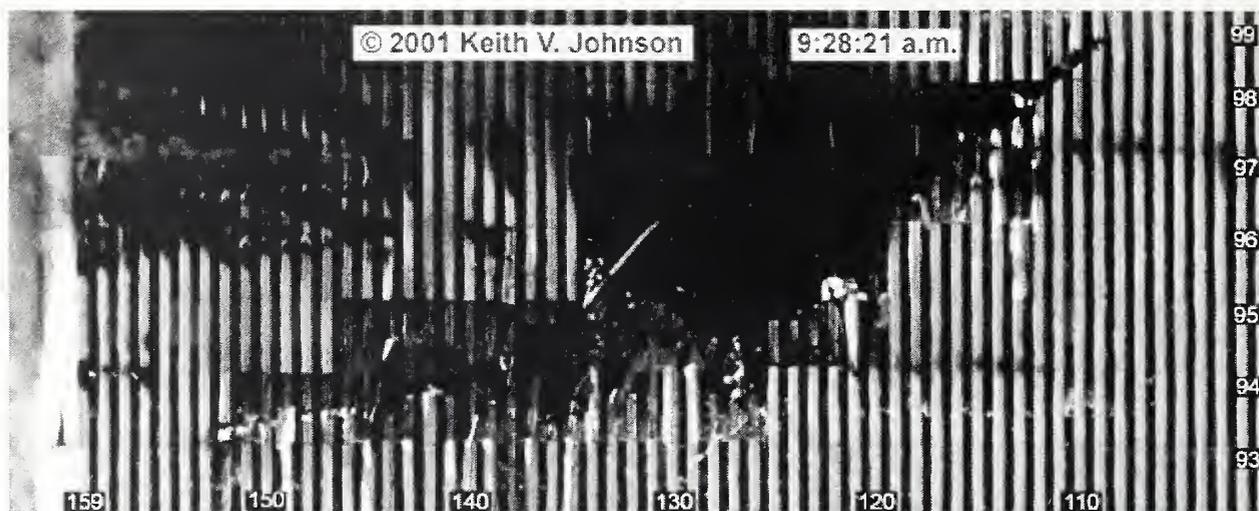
This cropped photograph shows the north face of WTC 1 at 9:28:21 a.m. The image has been rotated and enhanced. Column and floor numbers have been added.
